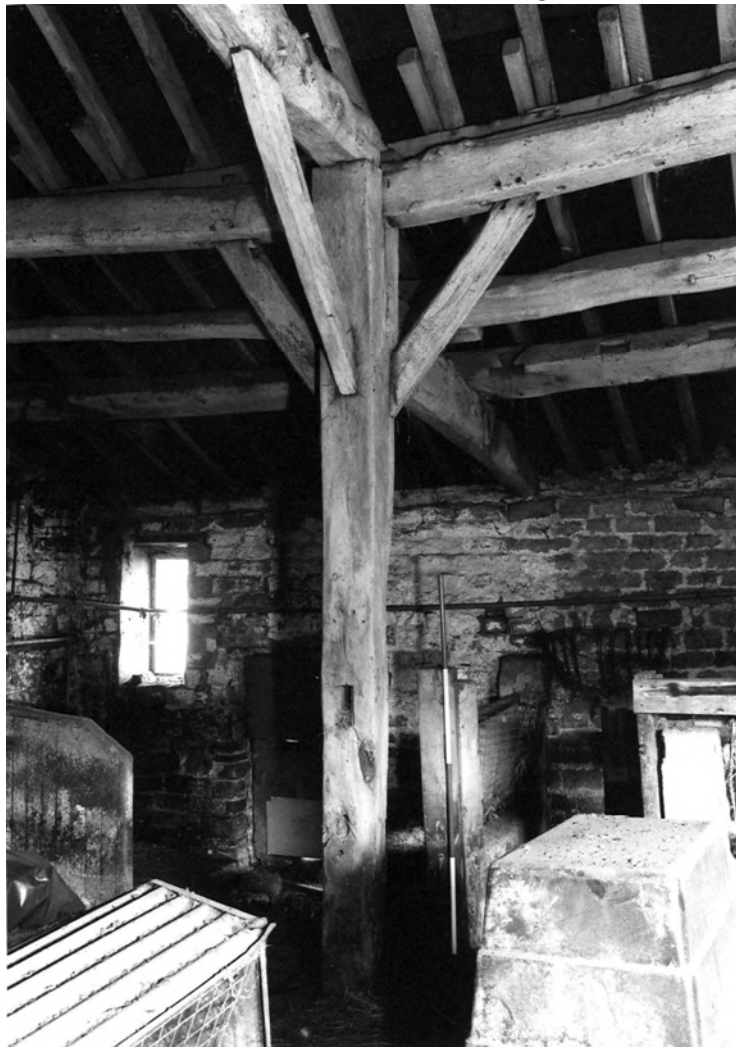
Shaw House Farm: Aisled Barn Interior. Facing North.
